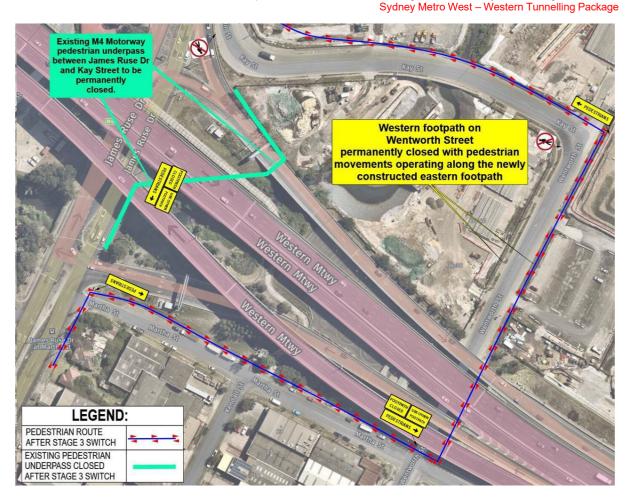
Wentworth St and M4 Underpass Footpath Diversions Overview
